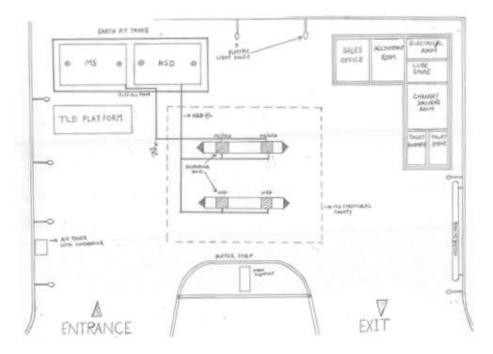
Schematic diagram of a Typical layout of a retail outlet *(Own source)
